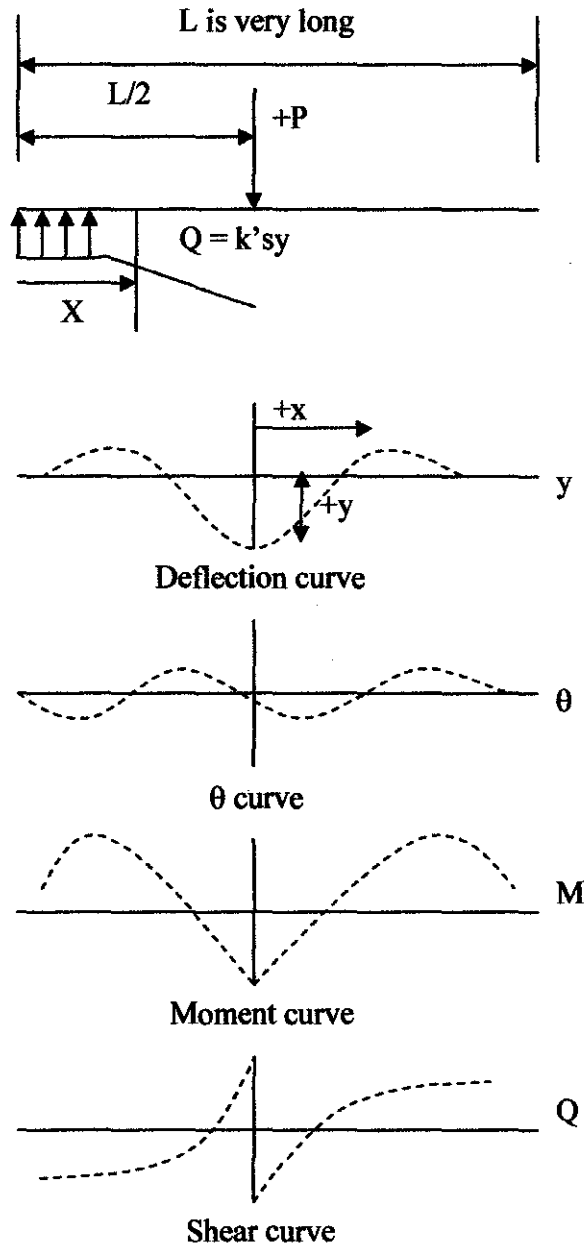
Infinite length beam on an elastic foundation with mid or center loading
